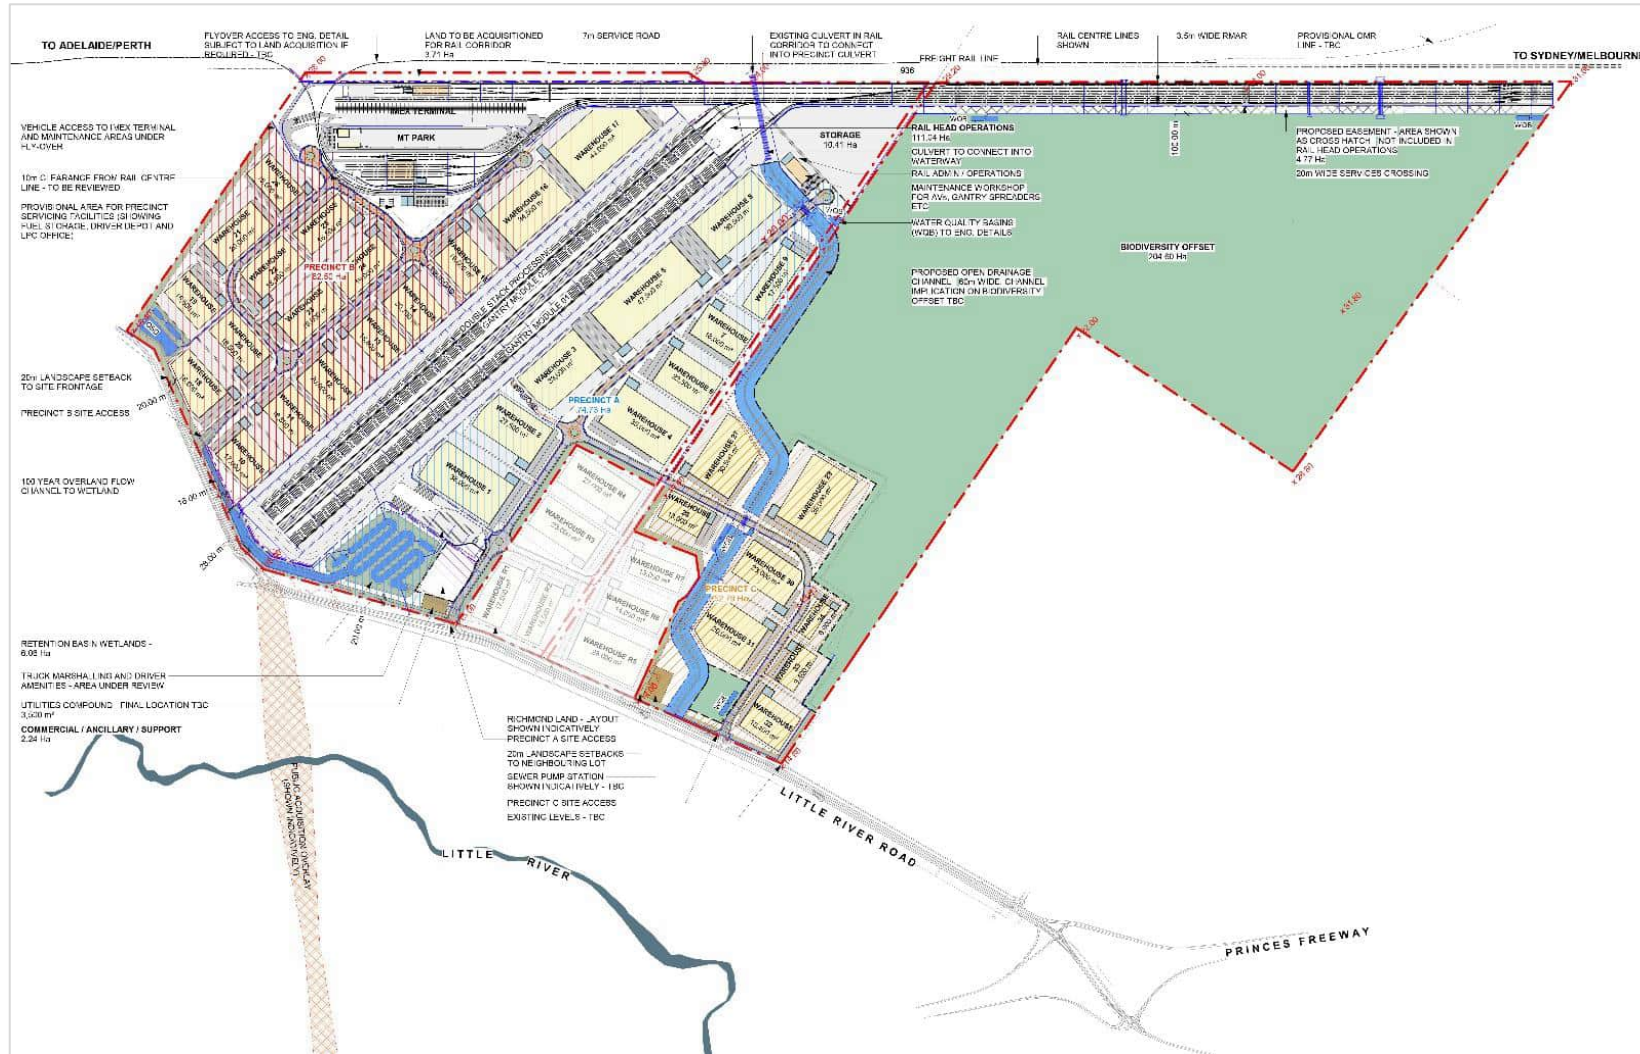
Proposed Masterplan Design Showing Project Site Location and Site Access Roads
